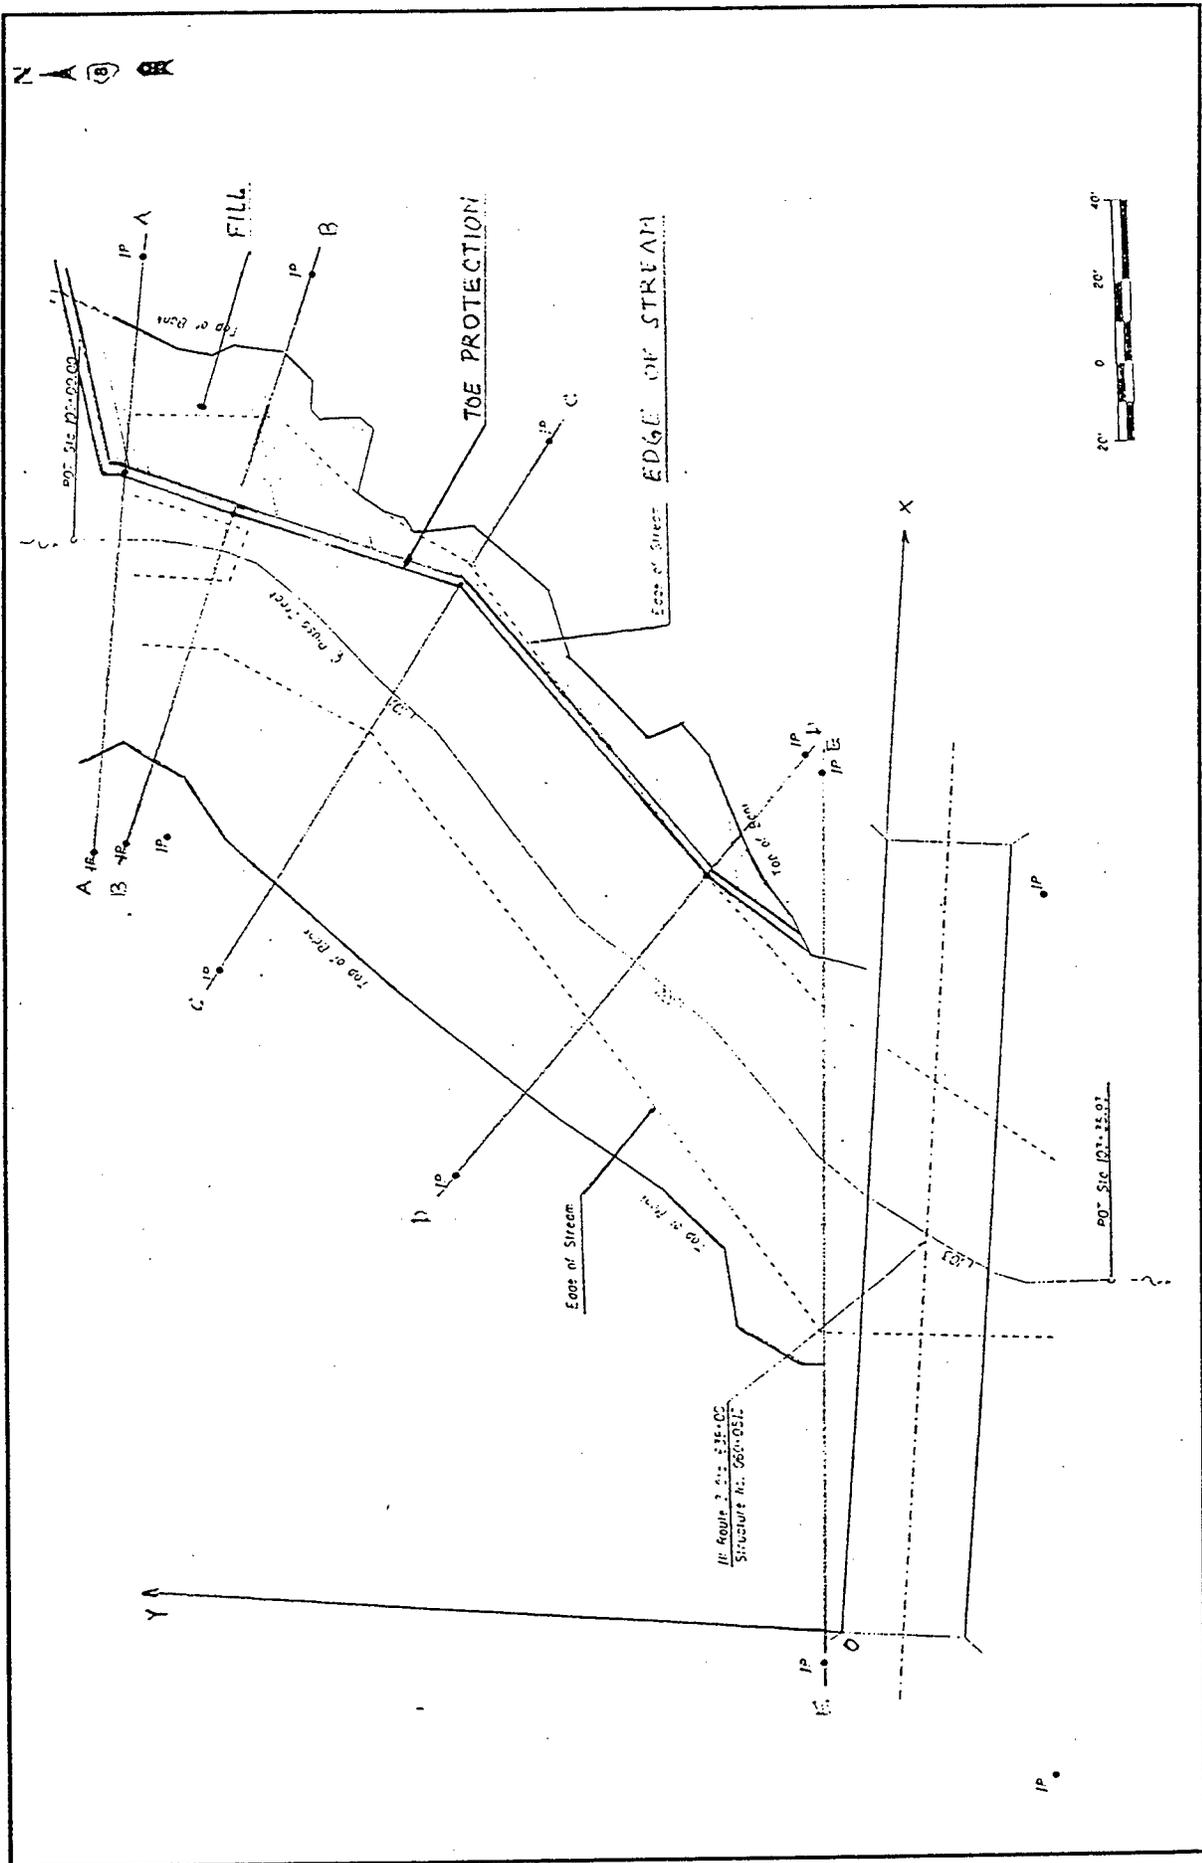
Piasa Creek site alternative 1 design schematic (plan view).
